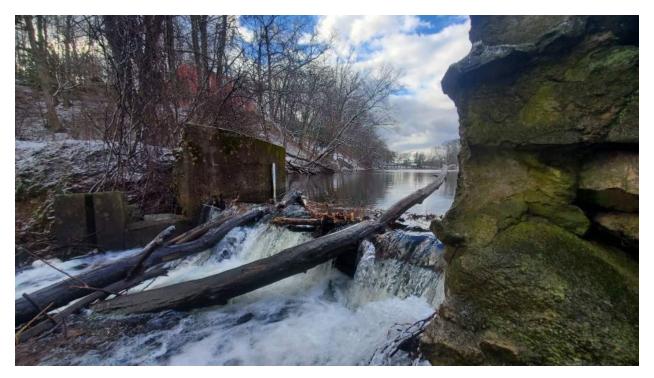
Eagle Lake Dam's (MA02263) primary spillway looking upstream. A staff gage is located on the right training wall.
